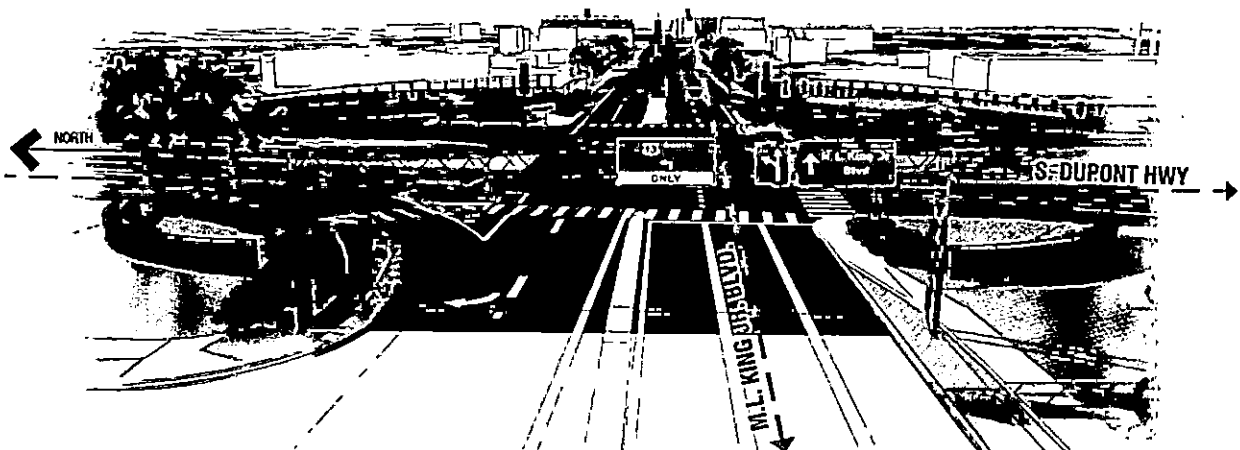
Potential Gateway 1 Location at Intersection of US 13 / DuPont Highway and MLK Boulevard, view looking east
